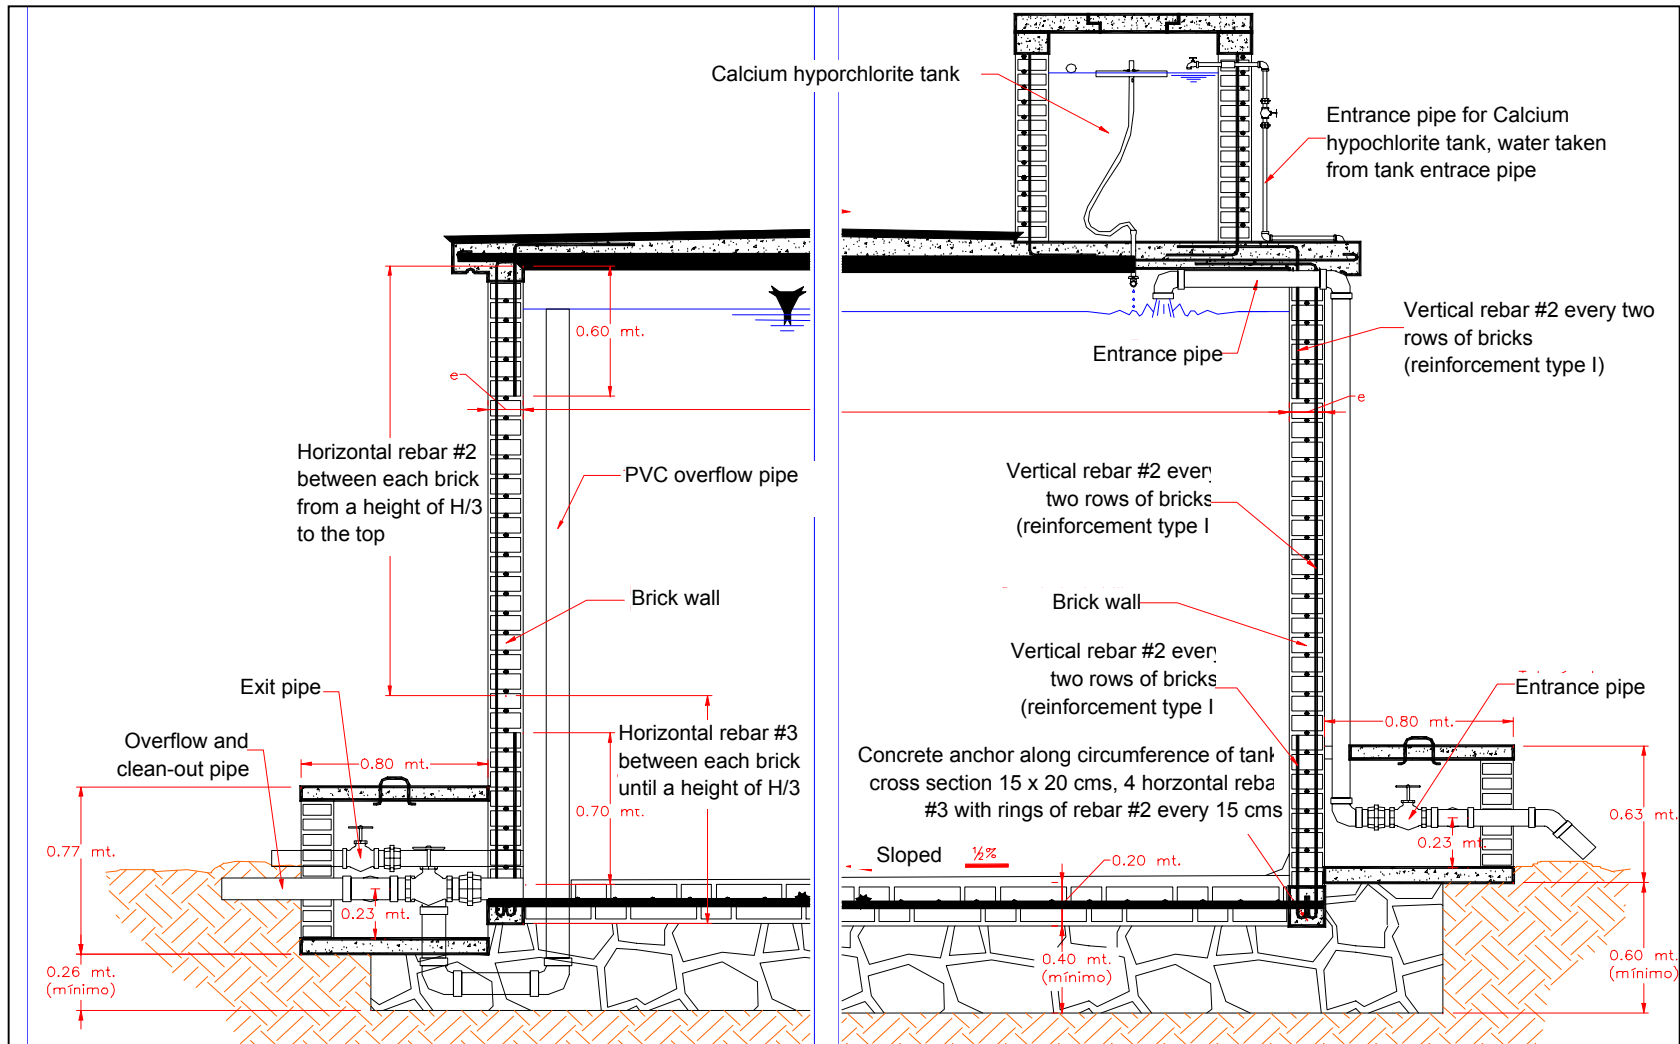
Plan view cross section of storage tank pipe entrance and specifications for construction.
